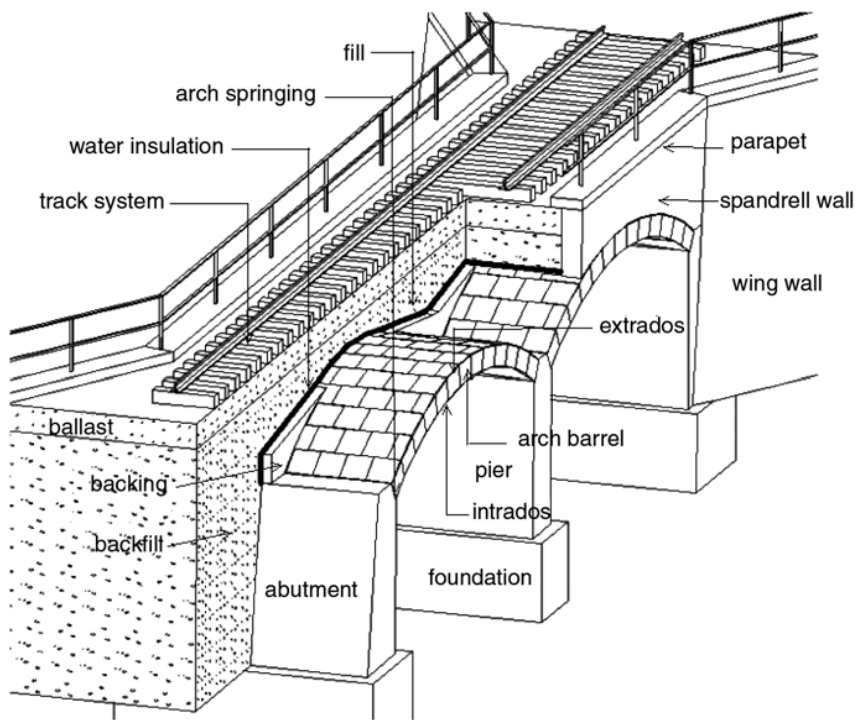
Typical structure of a double-span masonry arch railway bridge,
